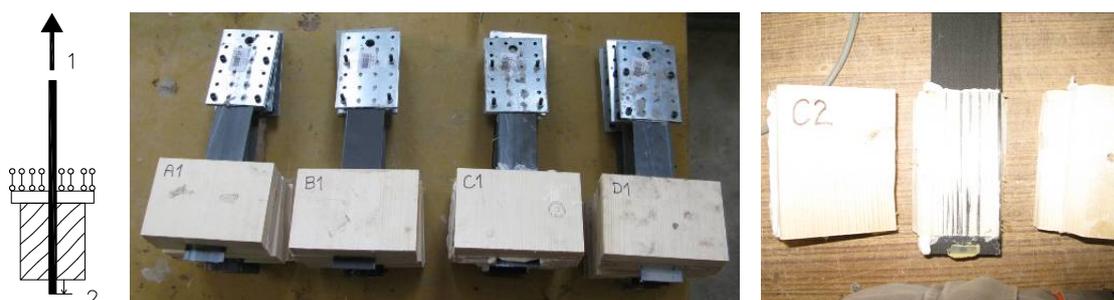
Test specimen made of laminated wood with glued-in lamella
